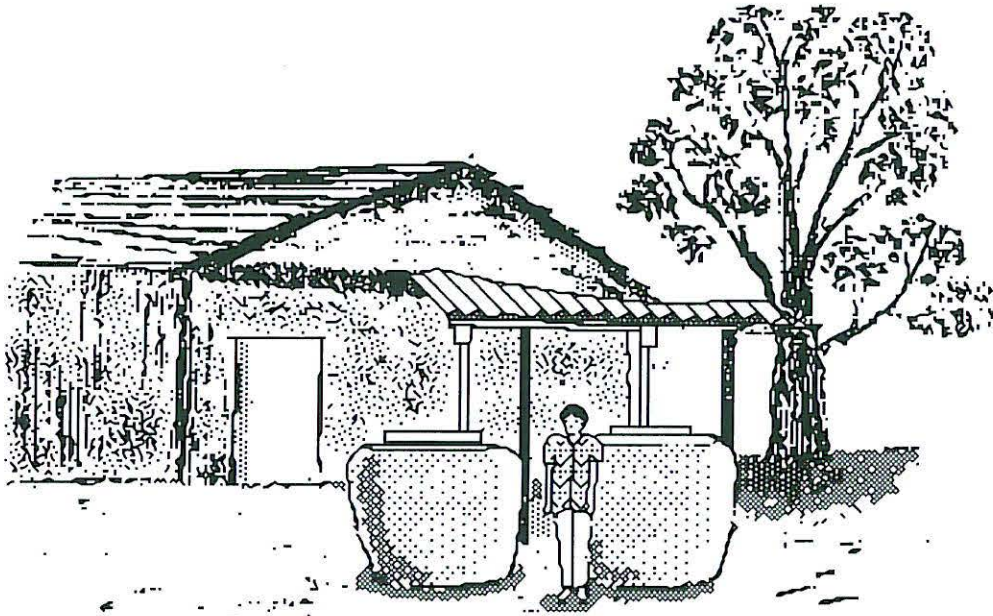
Large jars made of ferrocement are used in Thailand to harvest rainwater from roofs. These roof catchment devices may provide a family with enough drinking water to last through the dry season.
